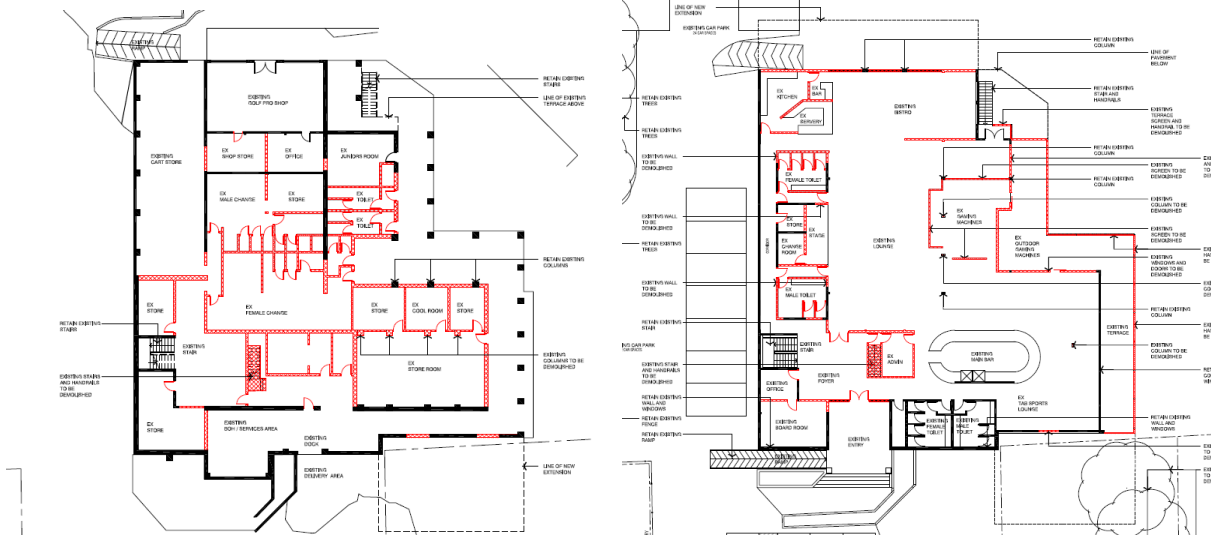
Proposed buildings: Wallacia Country Club (proposed demolition lower ground and ground levels)
